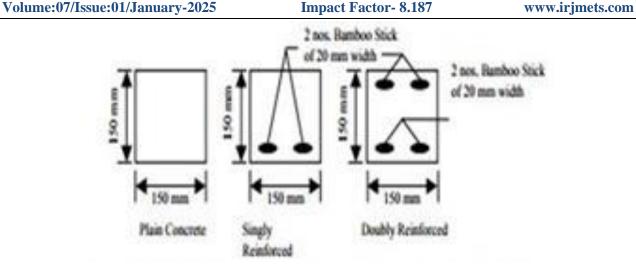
Cross Section of Sample Concrete Beam with and without Bamboo Reinforcement.
